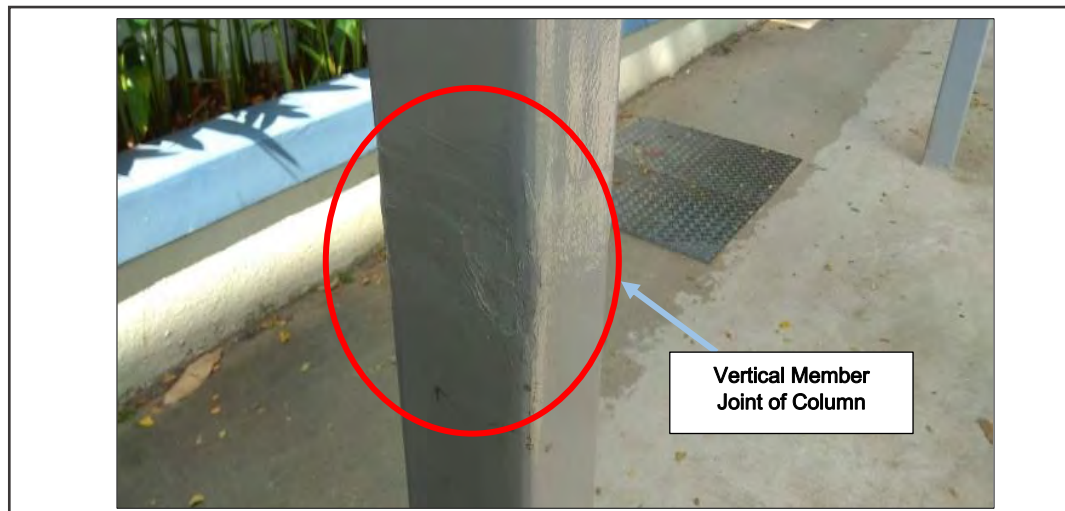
Vertical Member Joint of the Column Shall be Avoided
